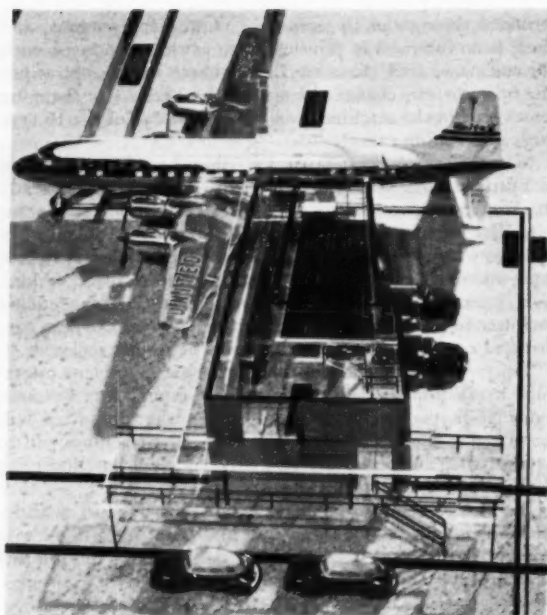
BUILDING MODEL OF PROPOSED AIRDOCK
